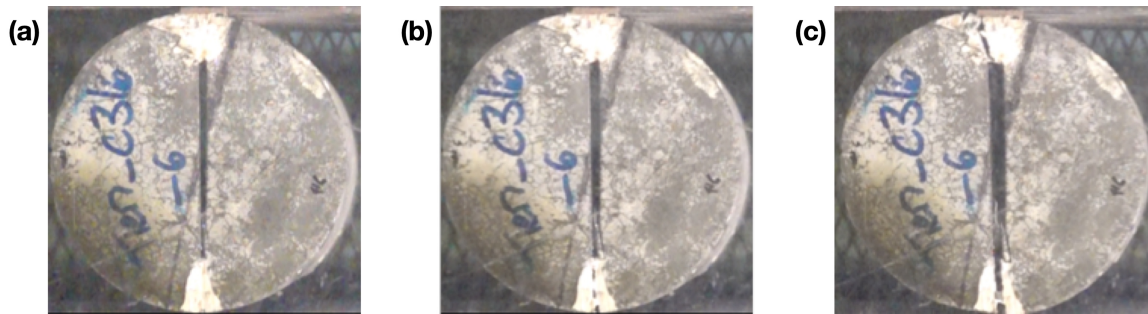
Repaired concrete tension behavior at interface: (a) before failure, (b) crack initiation, and (c) at failure.
